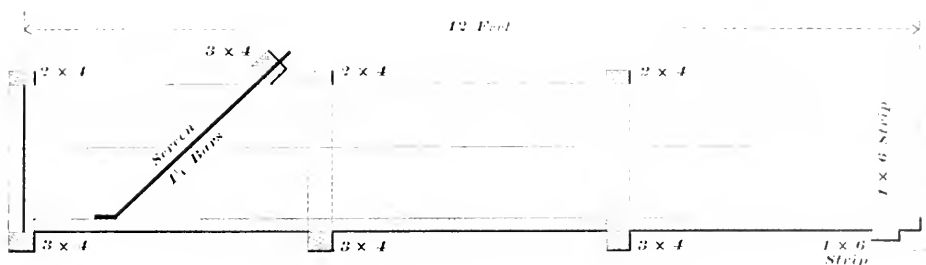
SECTION OF ELEVATION ON LINE *a b*, FIG. 5.
